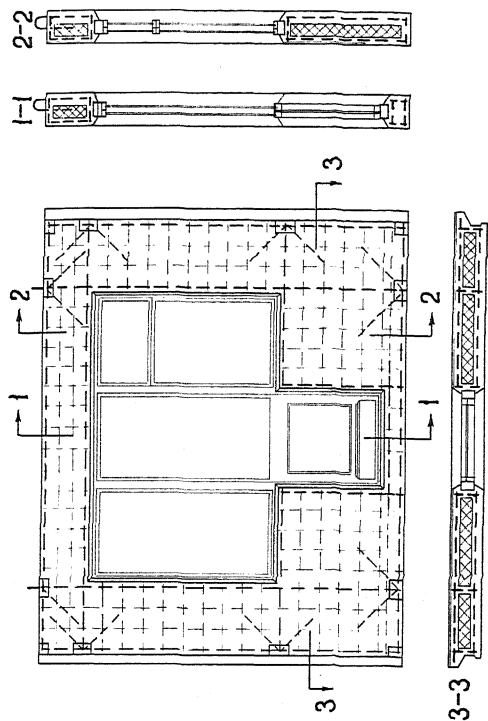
, a Design of a reinforced concrete panel for the external wall.
